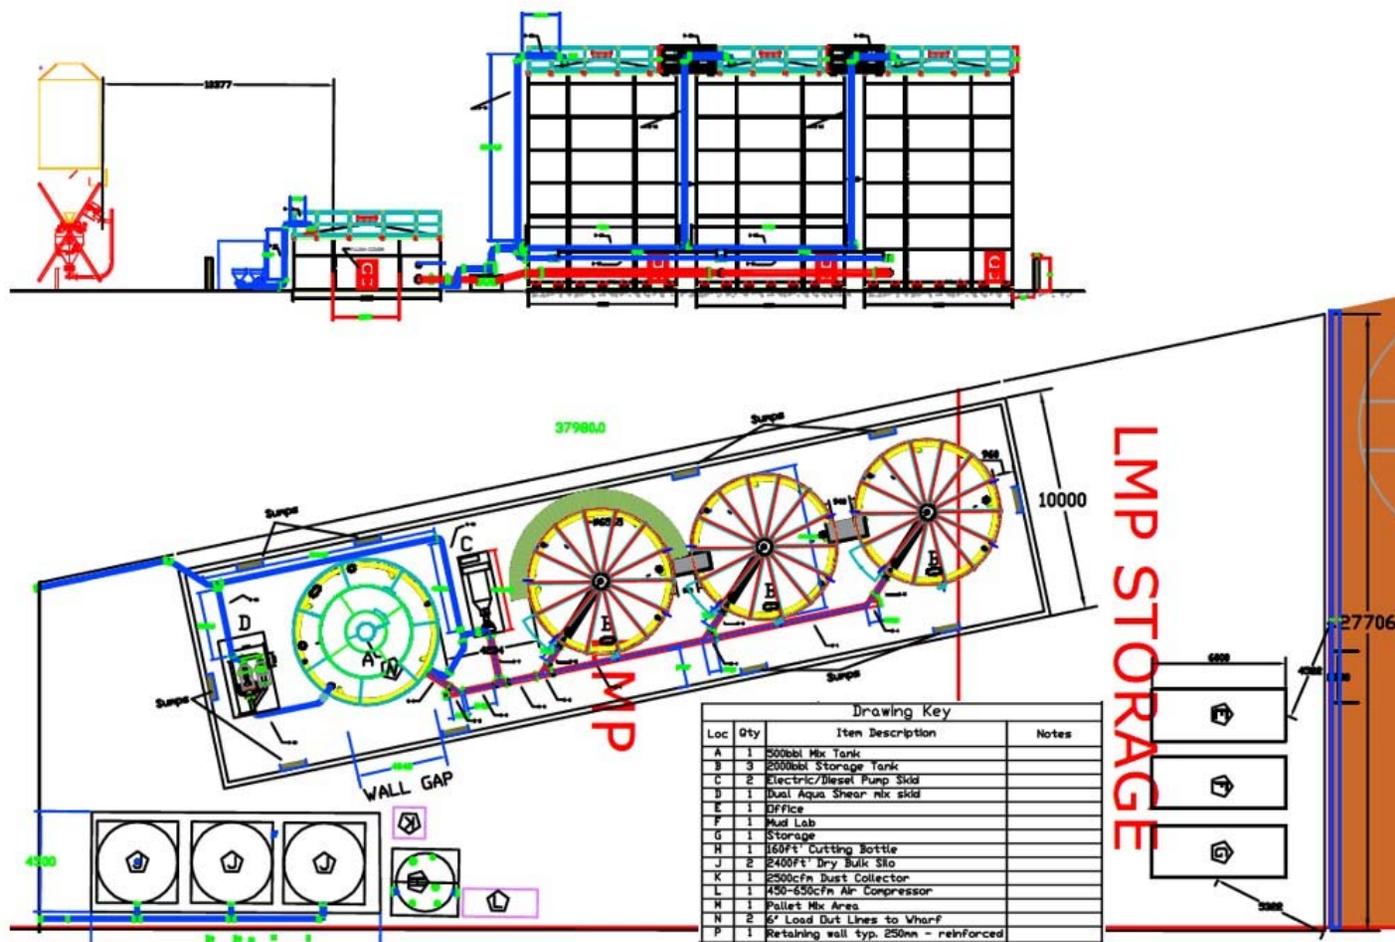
Schematic of the drilling fluids mixing plant and bulk facilities
